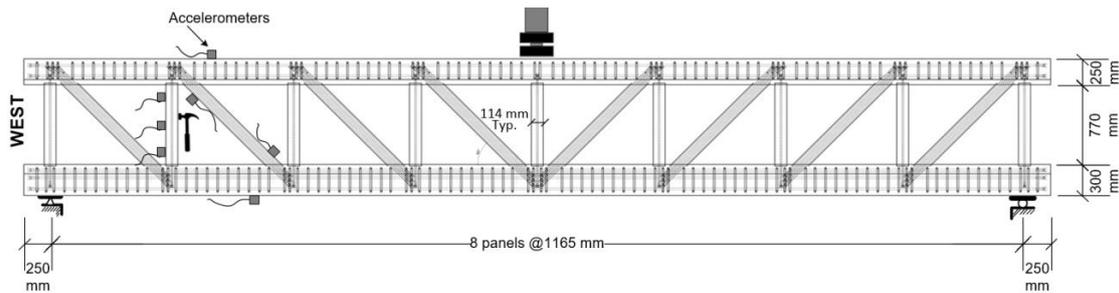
Dimensions and reinforcing details of the girder, and typical arrangement of accelerometers.
